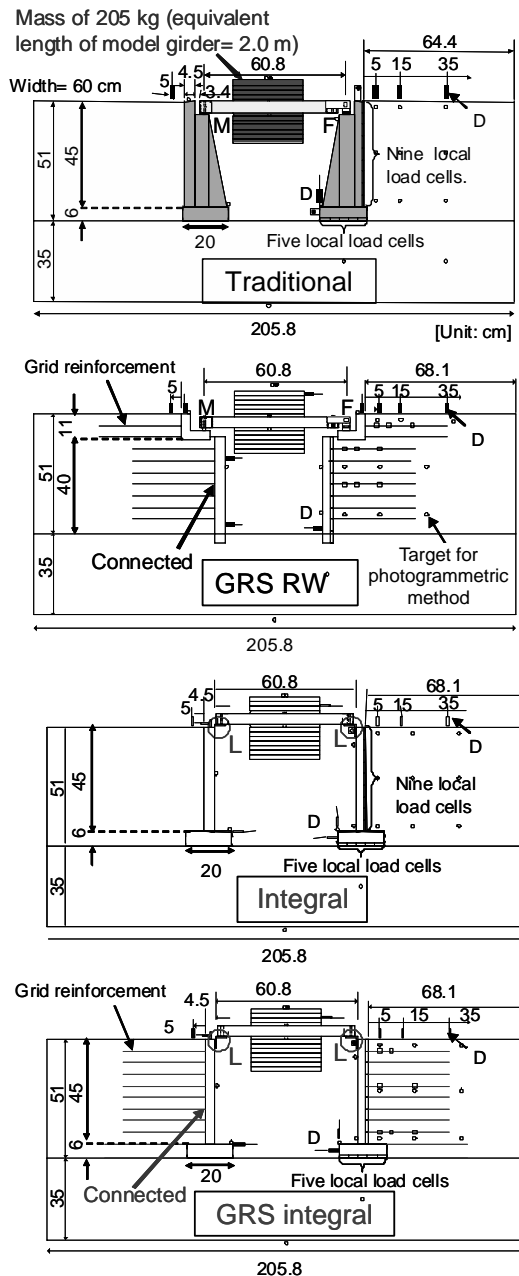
Models for shaking table tests, air-dried Toyoura sand ($D_r = 90\%$); D: displacement transducer; M: movable (sliding) shoe; F: fixed (hinged) shoe; and L: L-shaped metal fixture
